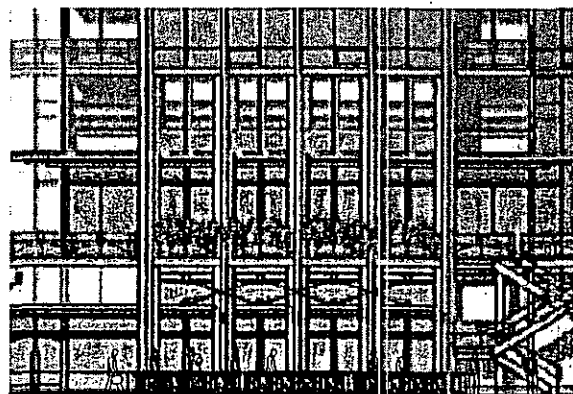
DETAIL ELEVATION - 4B SCALE: 1/16" = 1'-0"
